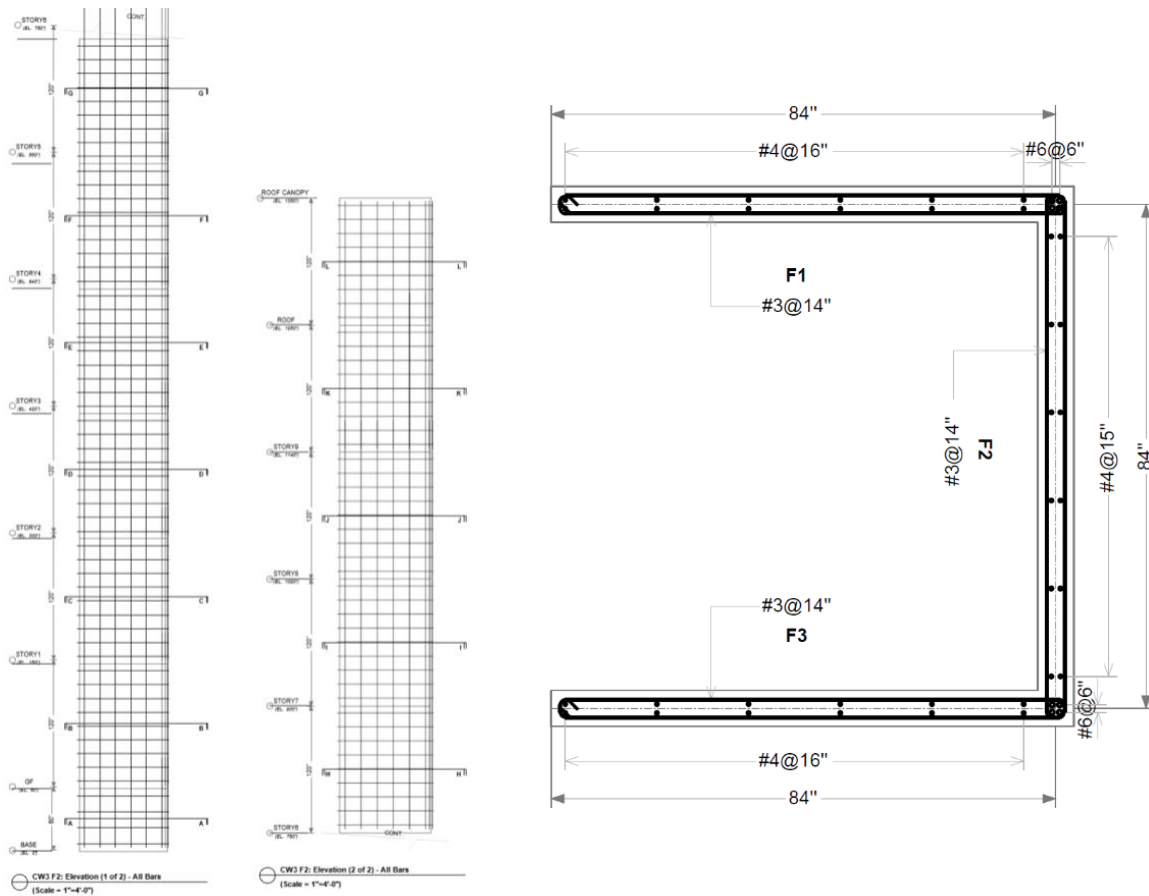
Rebar Diagram of Shear Wall (Elevation) Figure 14: Rebar Diagram of Shear Wall (Section View)
